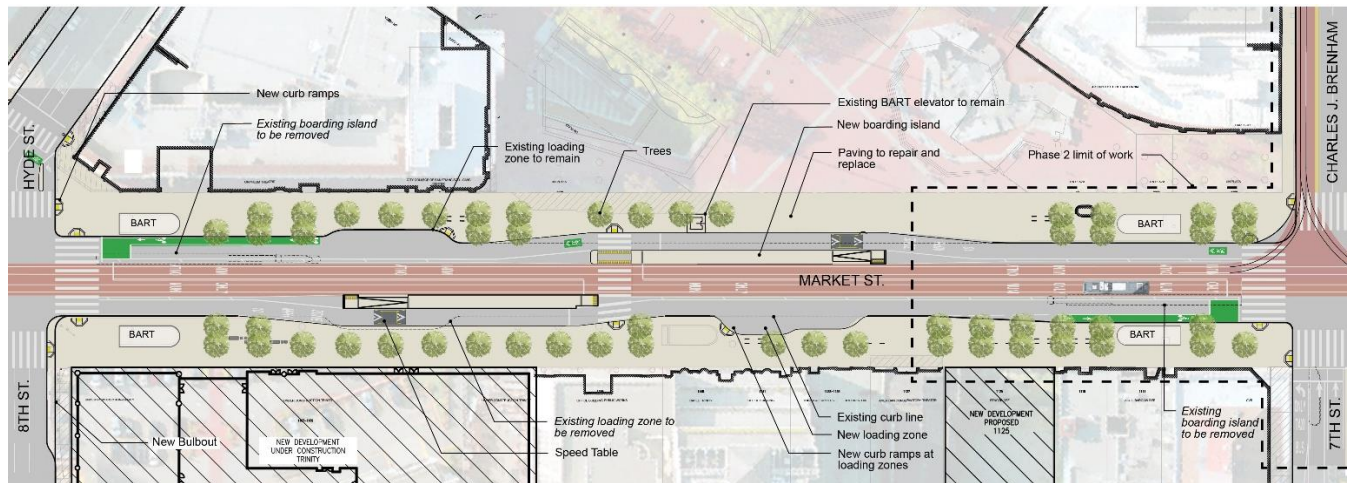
Plan View of Market Street, 8th to 7th streets with 2020 design
